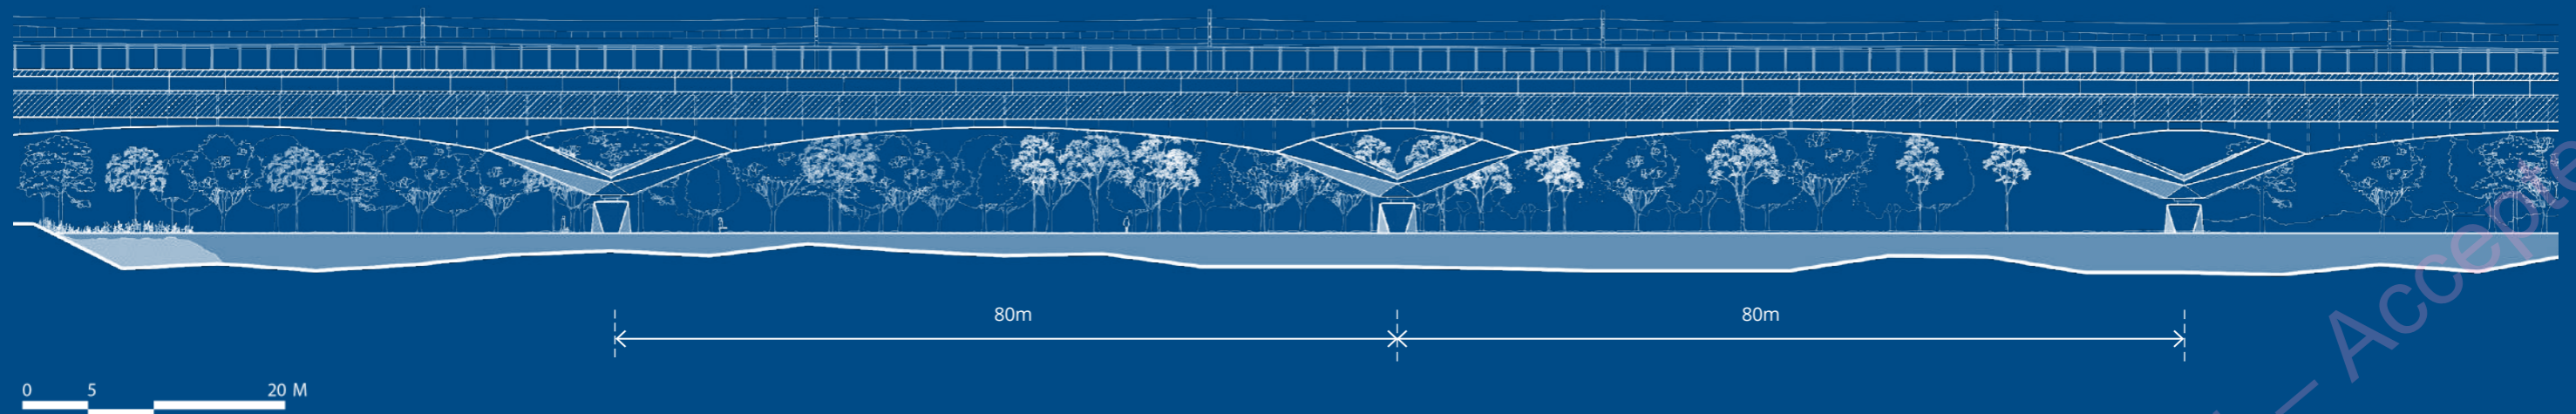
\_ Proposed elevation - Extended spans over Korda Lake
